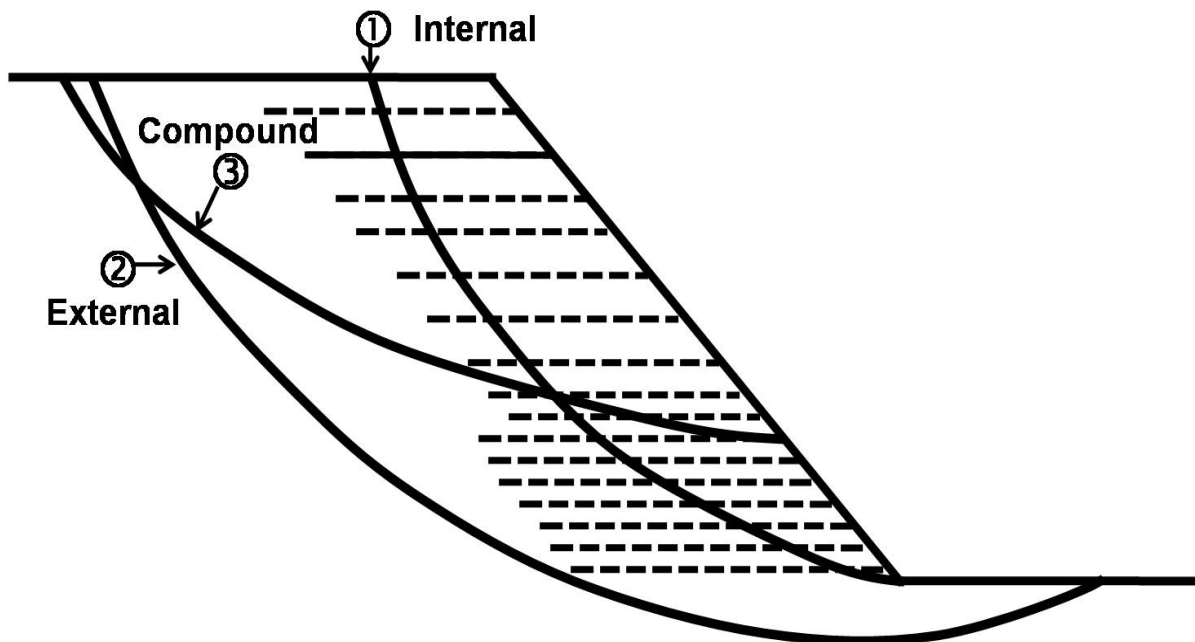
Failure modes for reinforced soil slopes including internal failure within the reinforced soil zone, external failure entirely outside the reinforced soil zone, and compound failure starting behind and passing through the reinforced soil zone.
